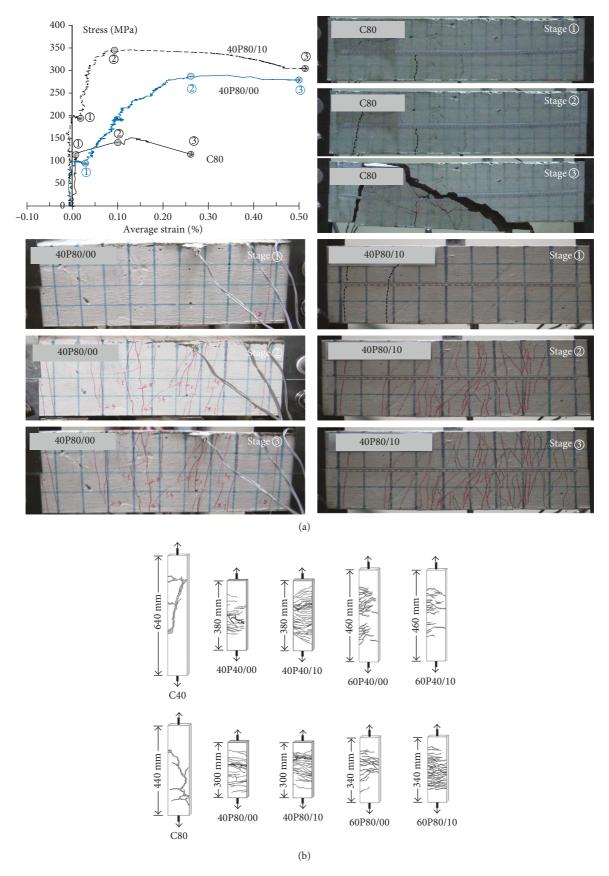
Typical cracking patterns of spliced specimens. (a) Typical crack propagation. (b) Cracking patterns at failure.
